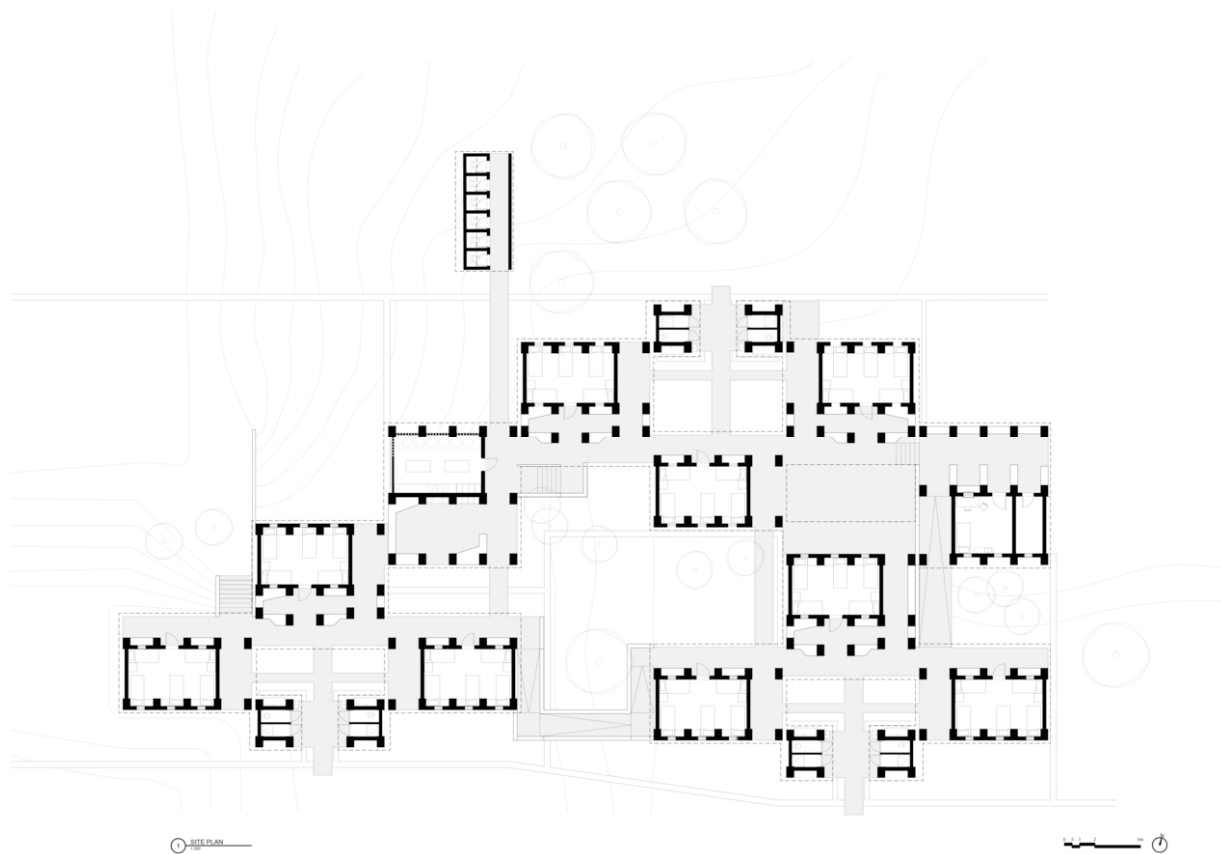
Floor Plan of Maternity Waiting Village (Silva, 2020)
